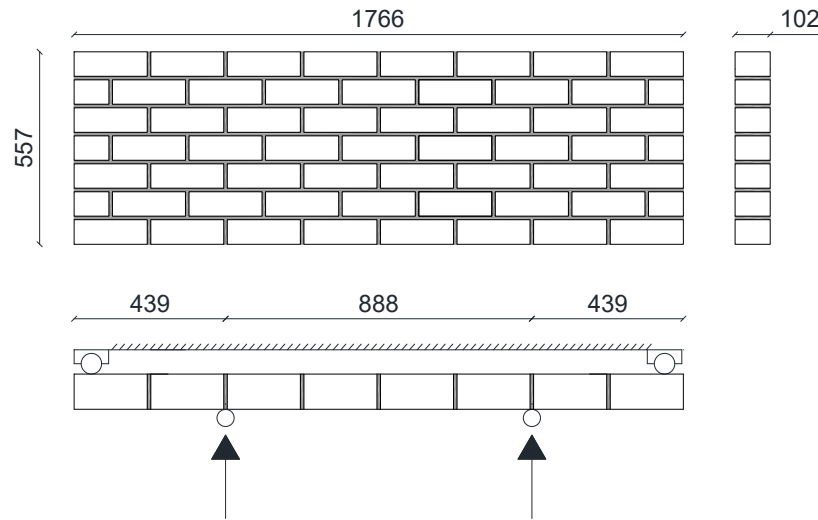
53: Schematic of CS masonry wallettes tested in Campaign B.
